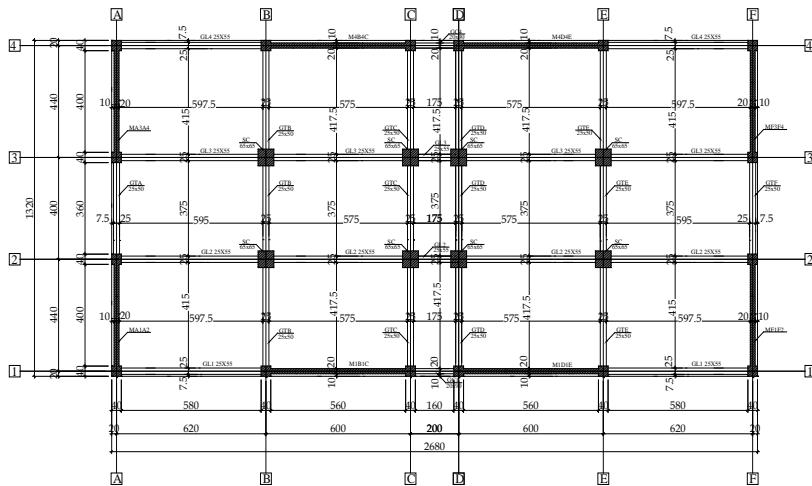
Plan current level type structure of reinforced concrete walls analyzed
